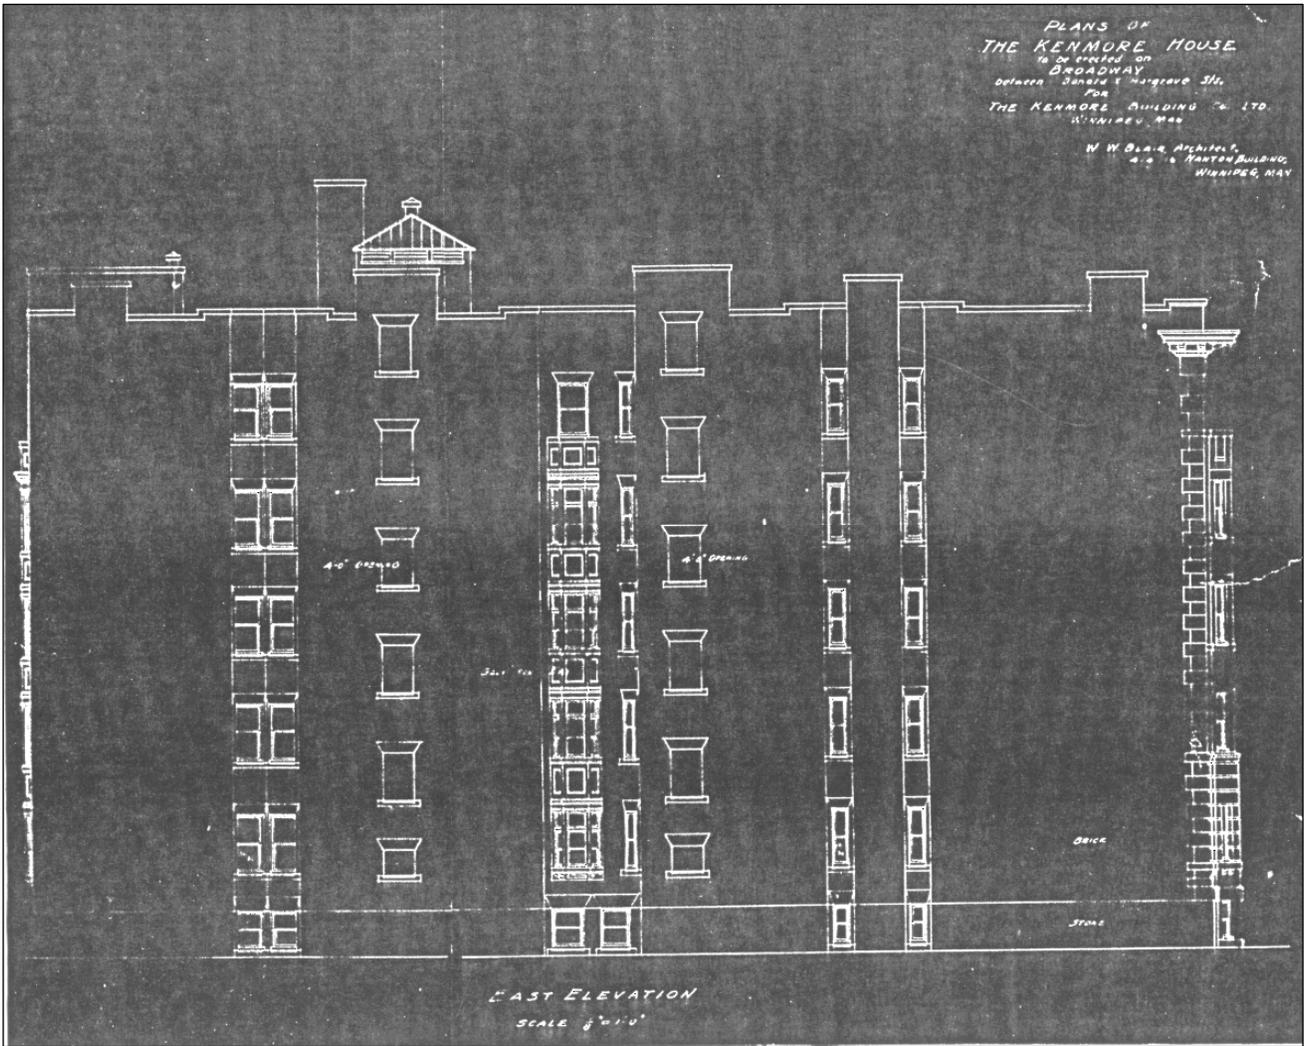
The Princeton Apartments, “East Elevation.” (Reproduced from City of Winnipeg, Architect’s Plans, #1045/1909.)
